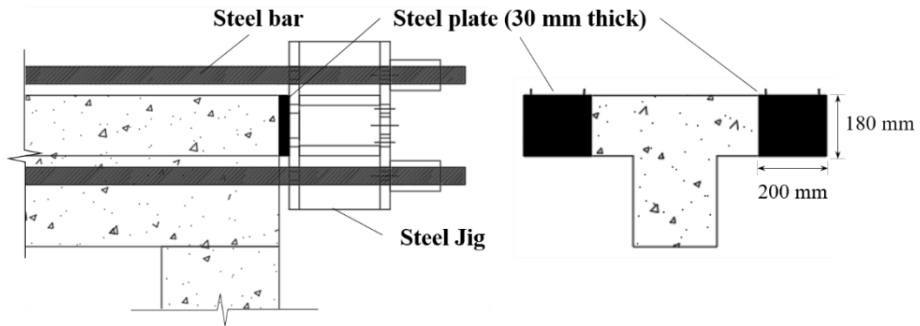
Contact detail between loading point and specimen (RC-0, IN-1, IN-2)
